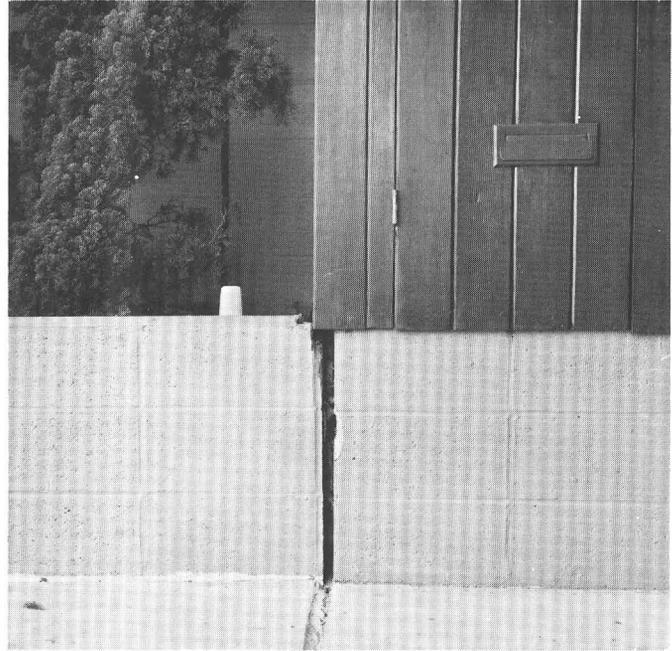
Damaged wall intersected by earth crack I, 235 feet south of Overhill Drive. Photograph taken January 1961.
